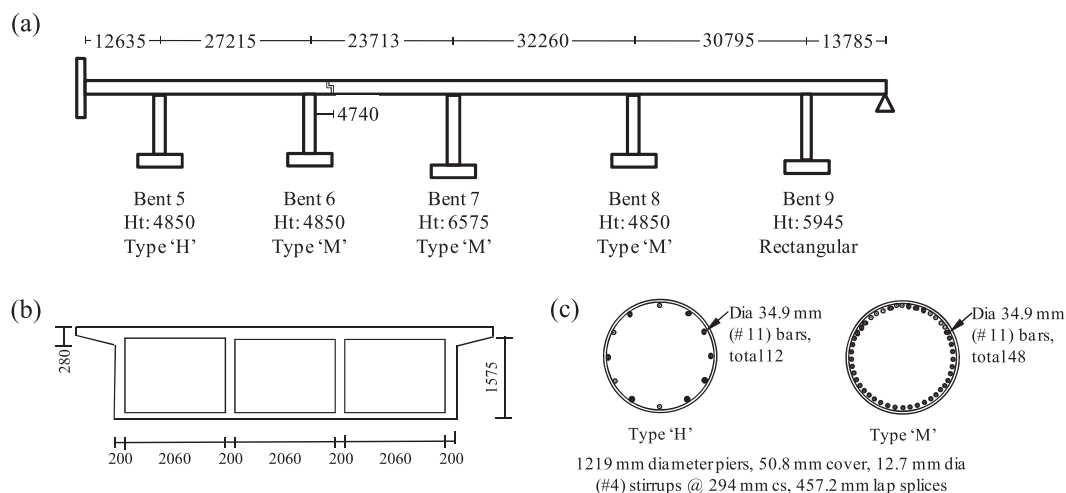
(a) The test-bed bridge (schematic), (b) cross-section of bridge girder, and (c) cross sections of type 'H' and 'M' piers (all units are in mm).
